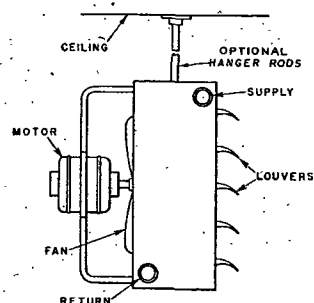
PROPELLER FAN TYPE UNIT HEATER—HORIZONTAL BLOW
